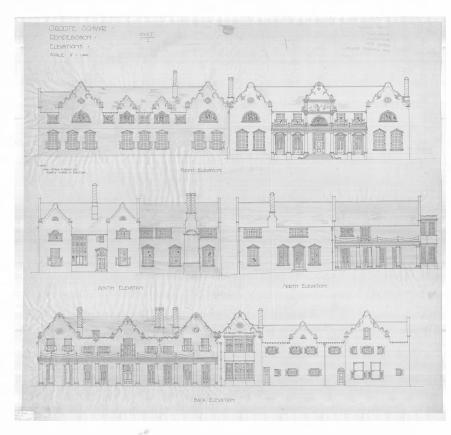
Sir Herbert Baker's elevations for the renovation of Groote Schuur, showcasing quintessential Cape Dutch details.
